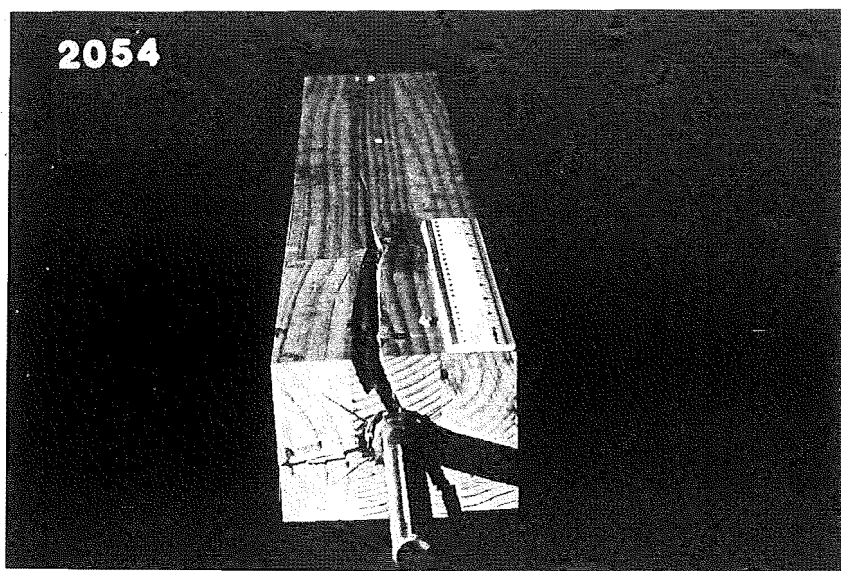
(a) Type 2 failure mode in a dry specimen
